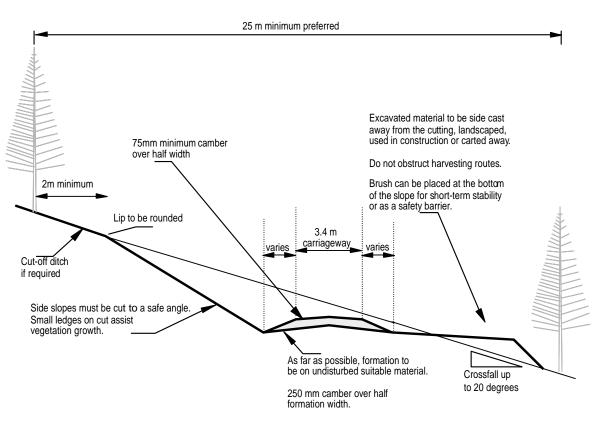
Typical road cross section (2) ("Carriageway" means running surface width; there should be sufficient "structural" width to ensure adequate lateral support to the carriageway.).
